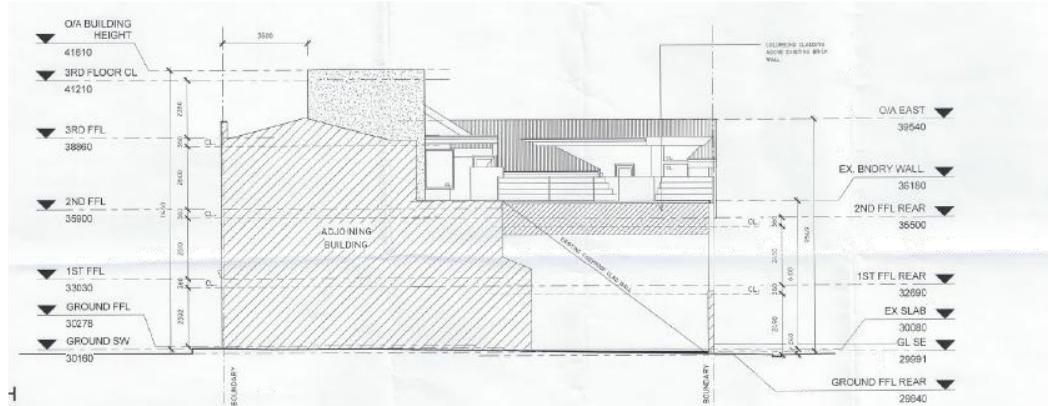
Excerpt of Endorsed South Elevation under Permit No. PLN14/0664
